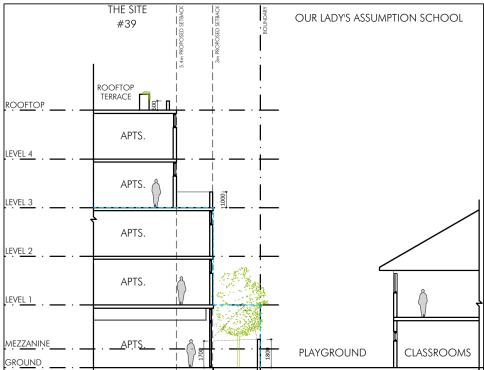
Extract of Section Plan 1A - North Western Lot Boundary
